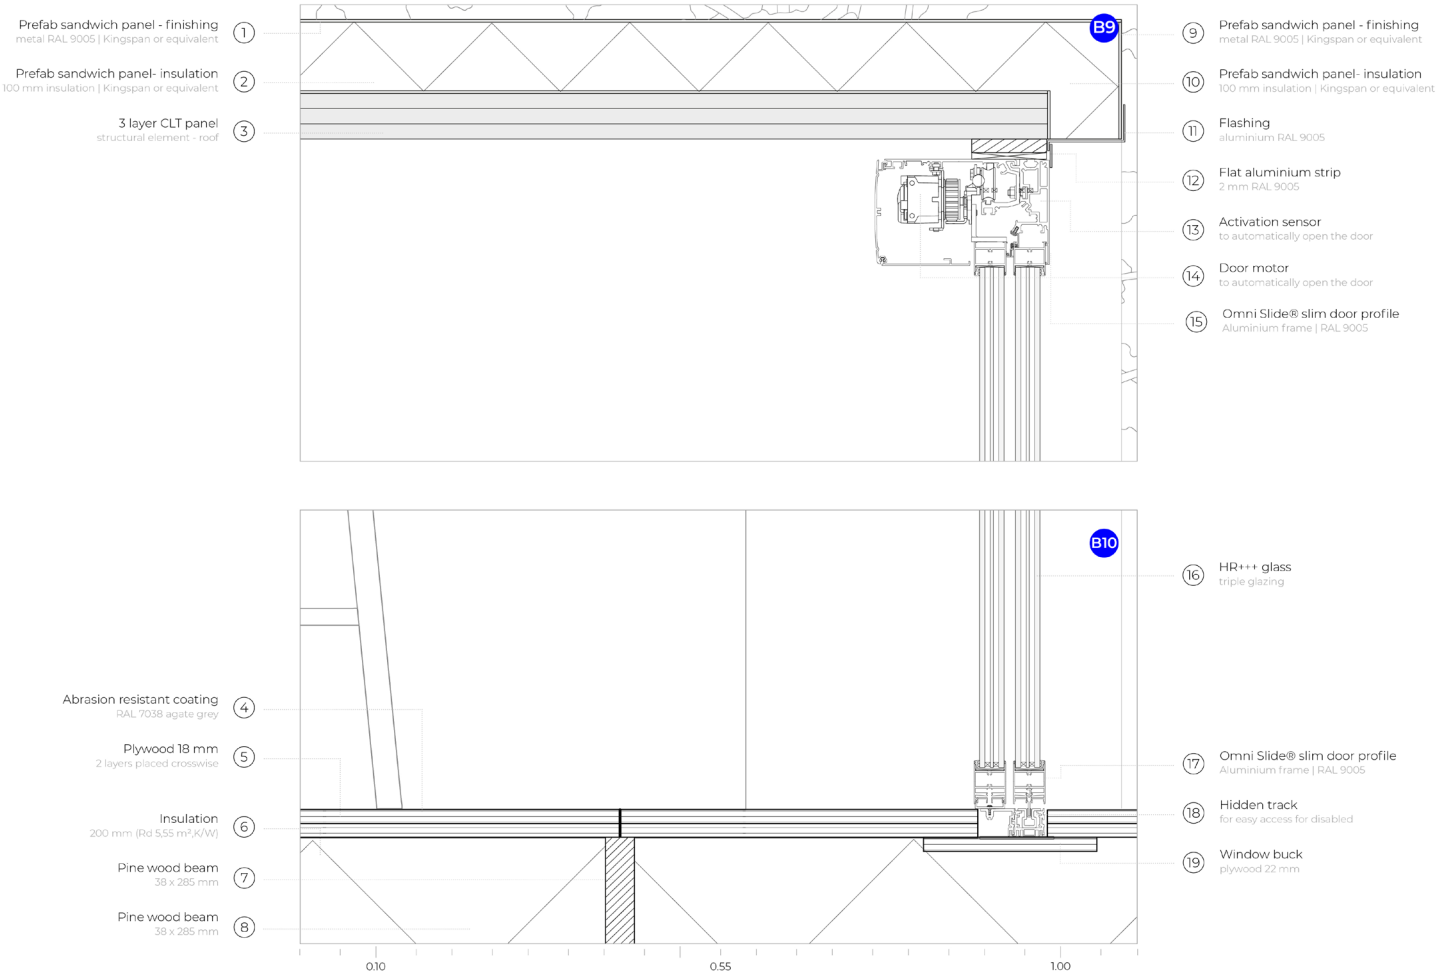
DETAIL DRAWINGS | VERTICAL SECTION B | SCALE 1:10
